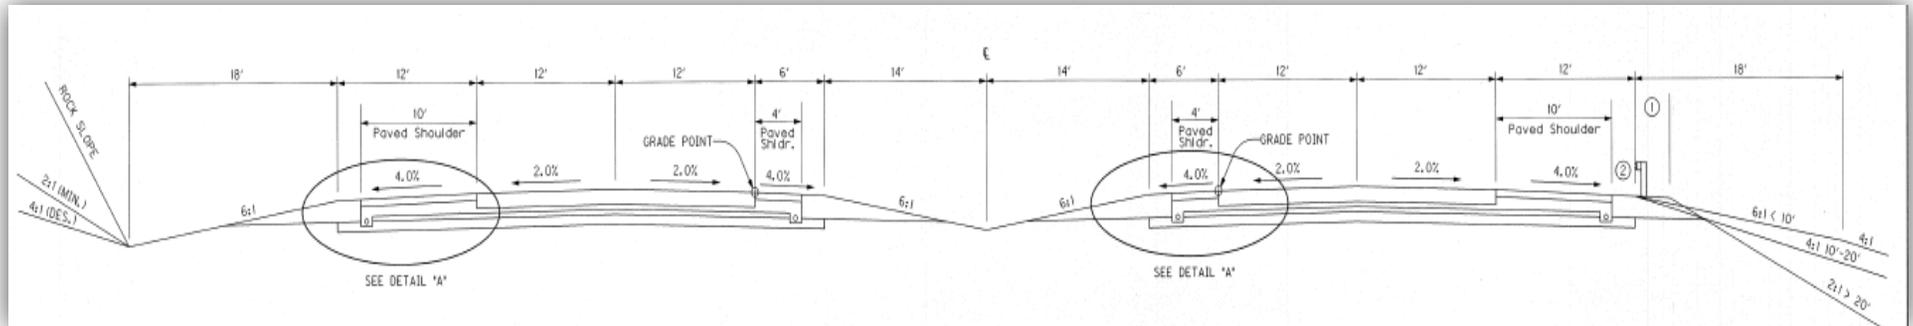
ETB Parkway Normal Typical Sections (from As Built Plans)
